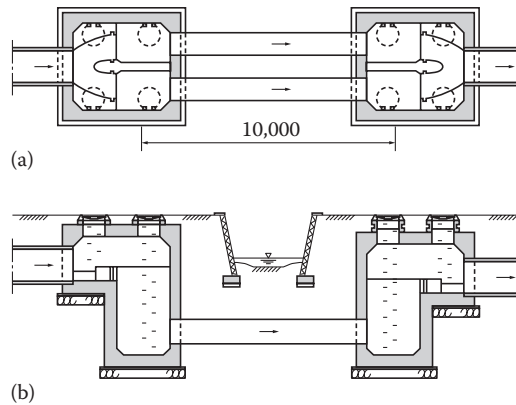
Example of inverted siphon: (a) plan and (b) section.
